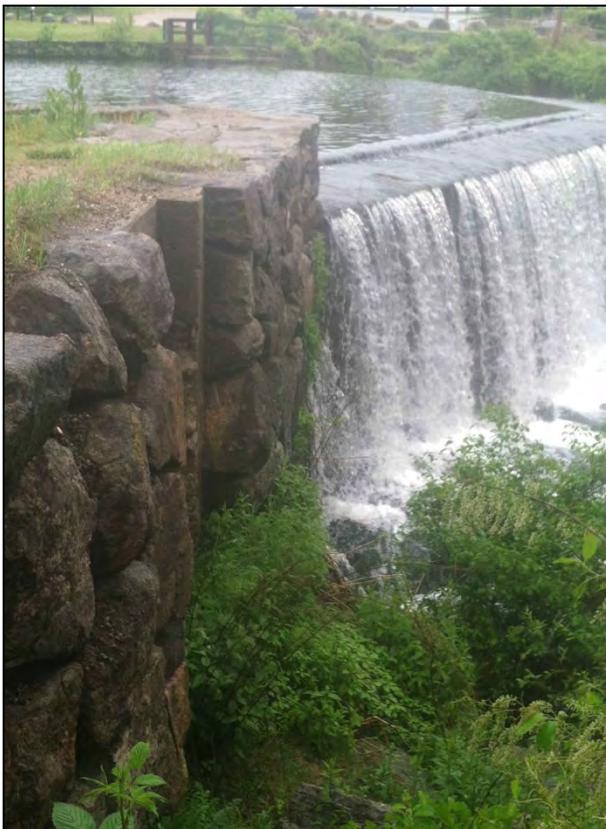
Overview of the downstream wall supporting the right embankment as viewed from the right looking left.
